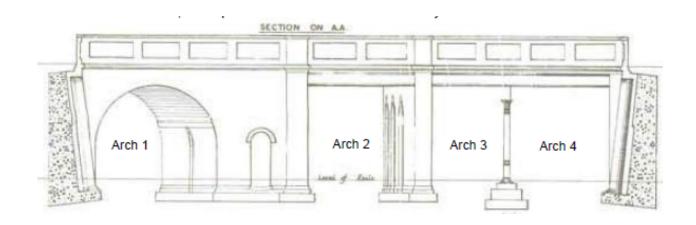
View on west elevation of original bridge (looking east). Arch 5 not shown in above illustration.
